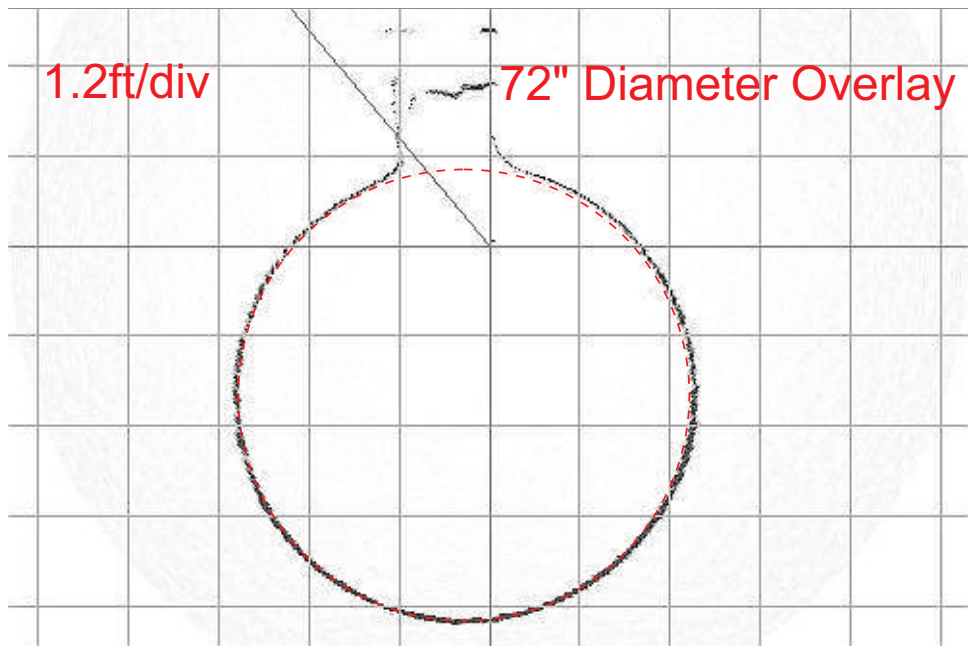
Sonar Profile of manhole - 331 feet downstream of Access Point 1.
